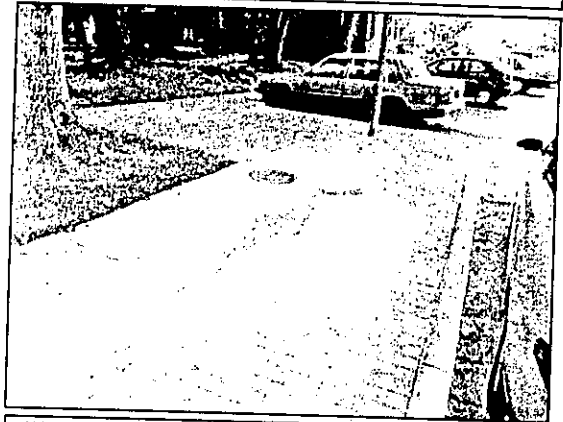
Brick pavers and concrete components are not properly pitched to move water to the storm water system.
